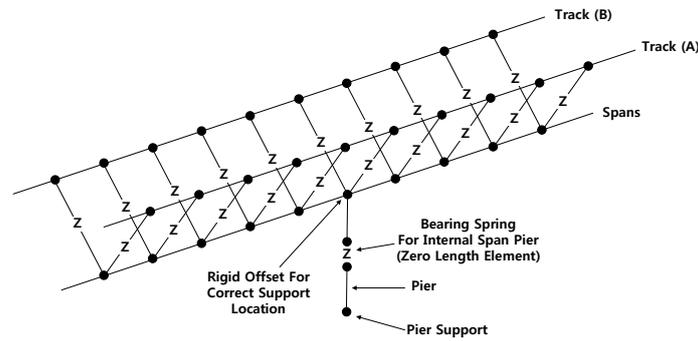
Schematic diagram of Track-Deck(Span)-Pier
